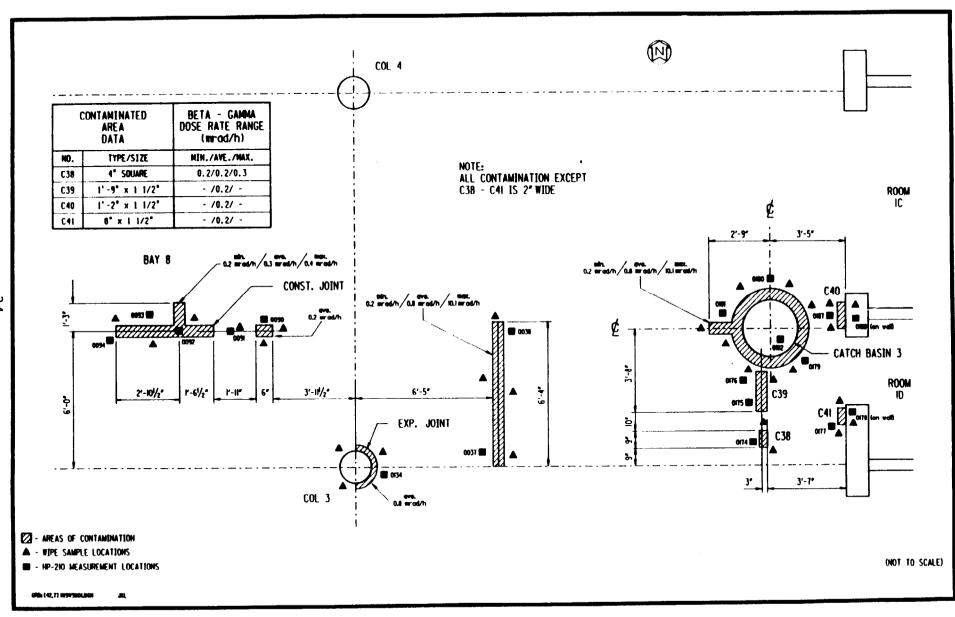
13 AREAS OF CONTAMINATION - BAY 8 (ROOM 1, FIRST FLOOR)
